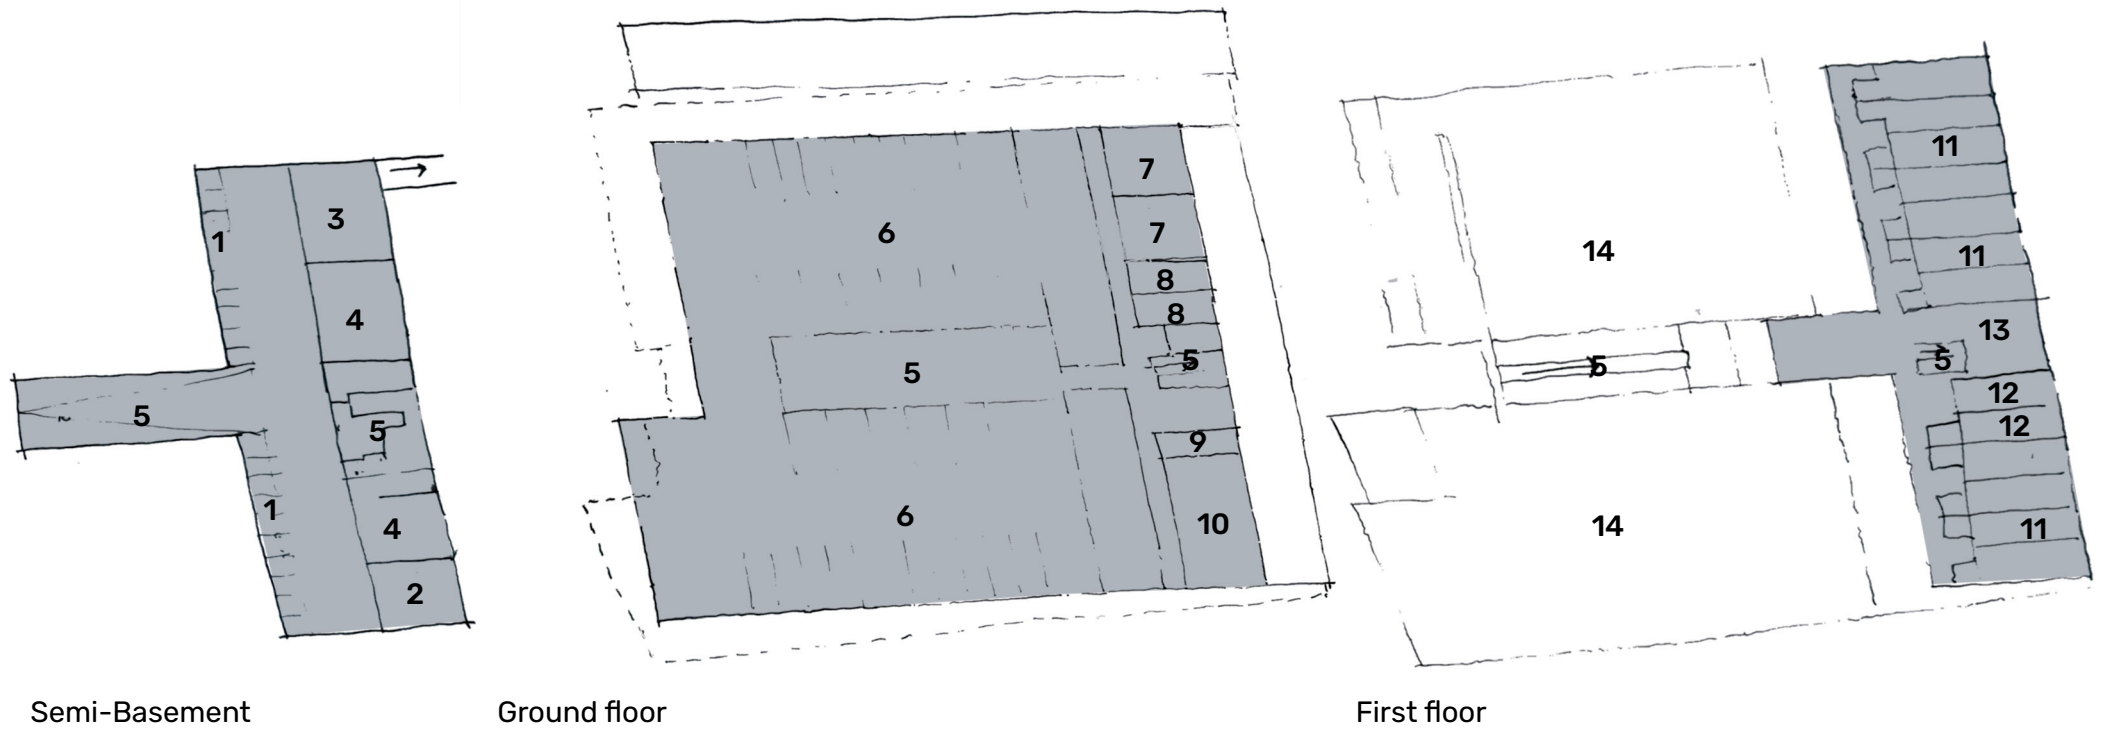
Centro Gallega De Vela Floor plans (Author 2022)
